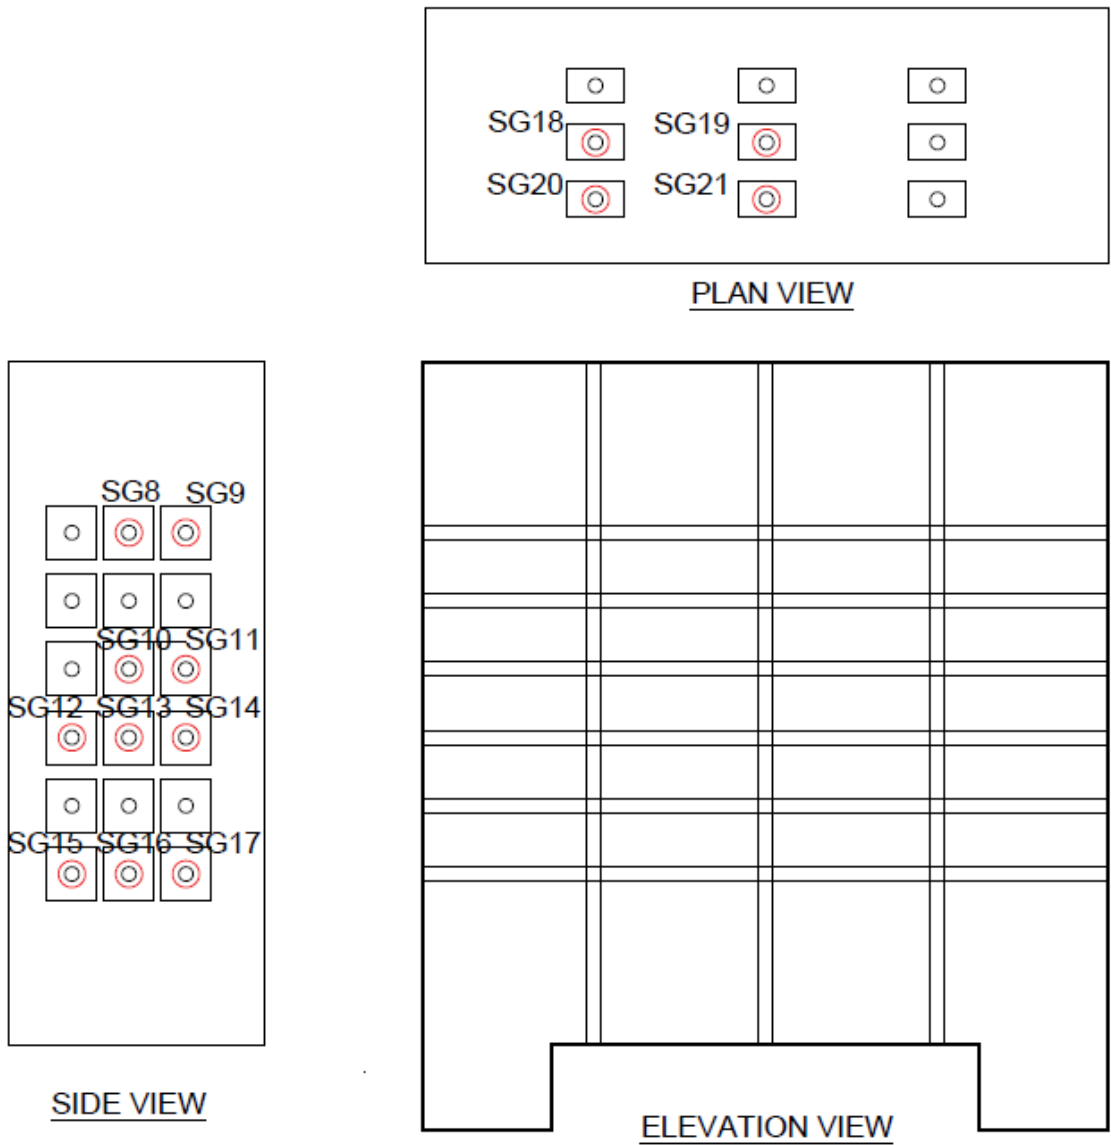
Specimen 2- Post-Tensioning Bar Strain Gage Labels and Locations
